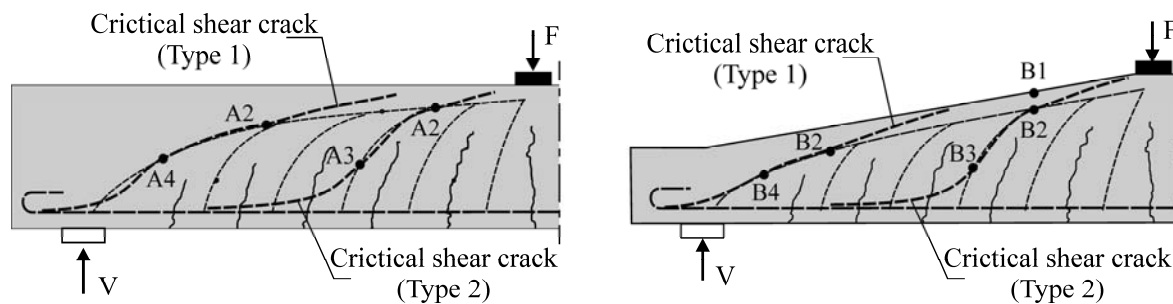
Two types of critical shear cracks in straight depth beams and haunched concrete beams.
